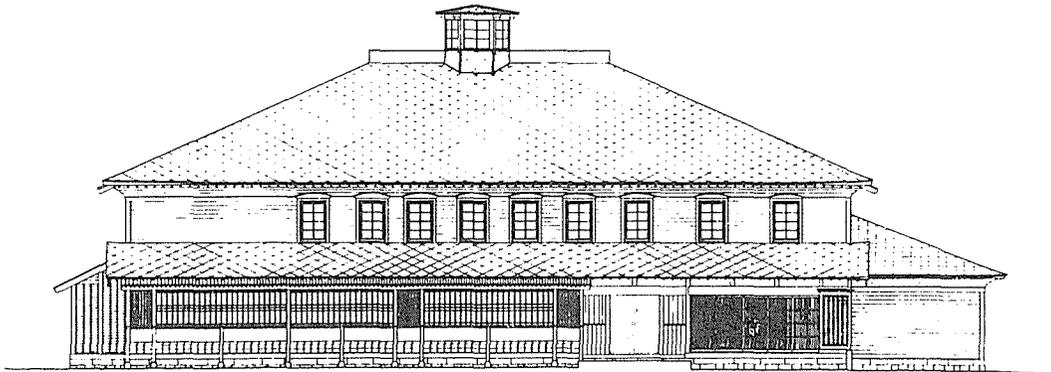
Sato House, c.1891, Utasutsu, Suttsu, front elevation.
